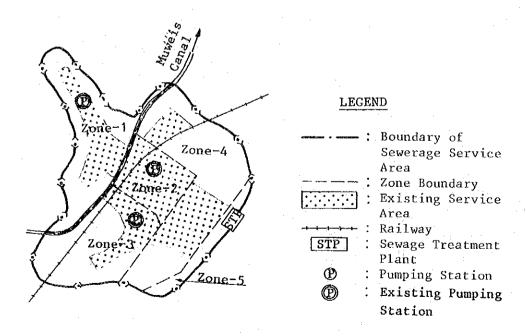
General Plan of Sewerage System in Minyet El Qamh
